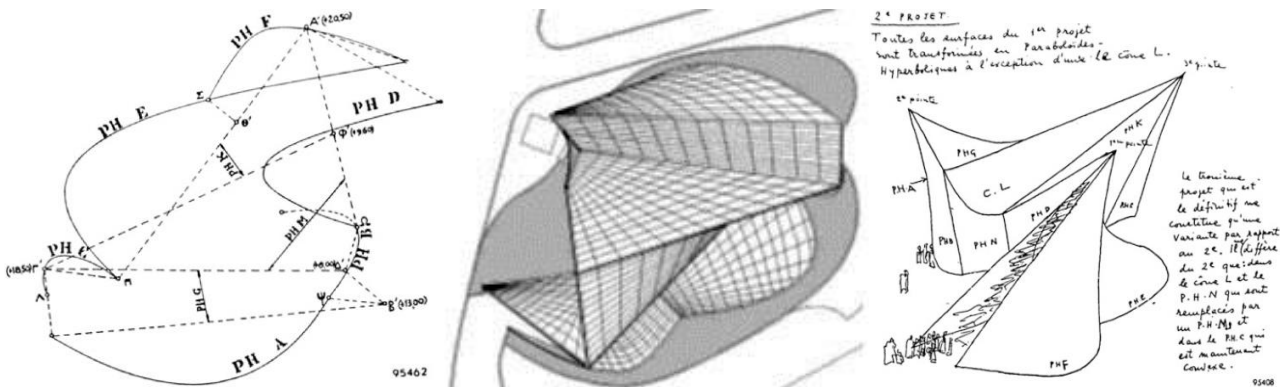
, 14. Philips Pavilion – geometric design of the plan. Source: [7][9]
